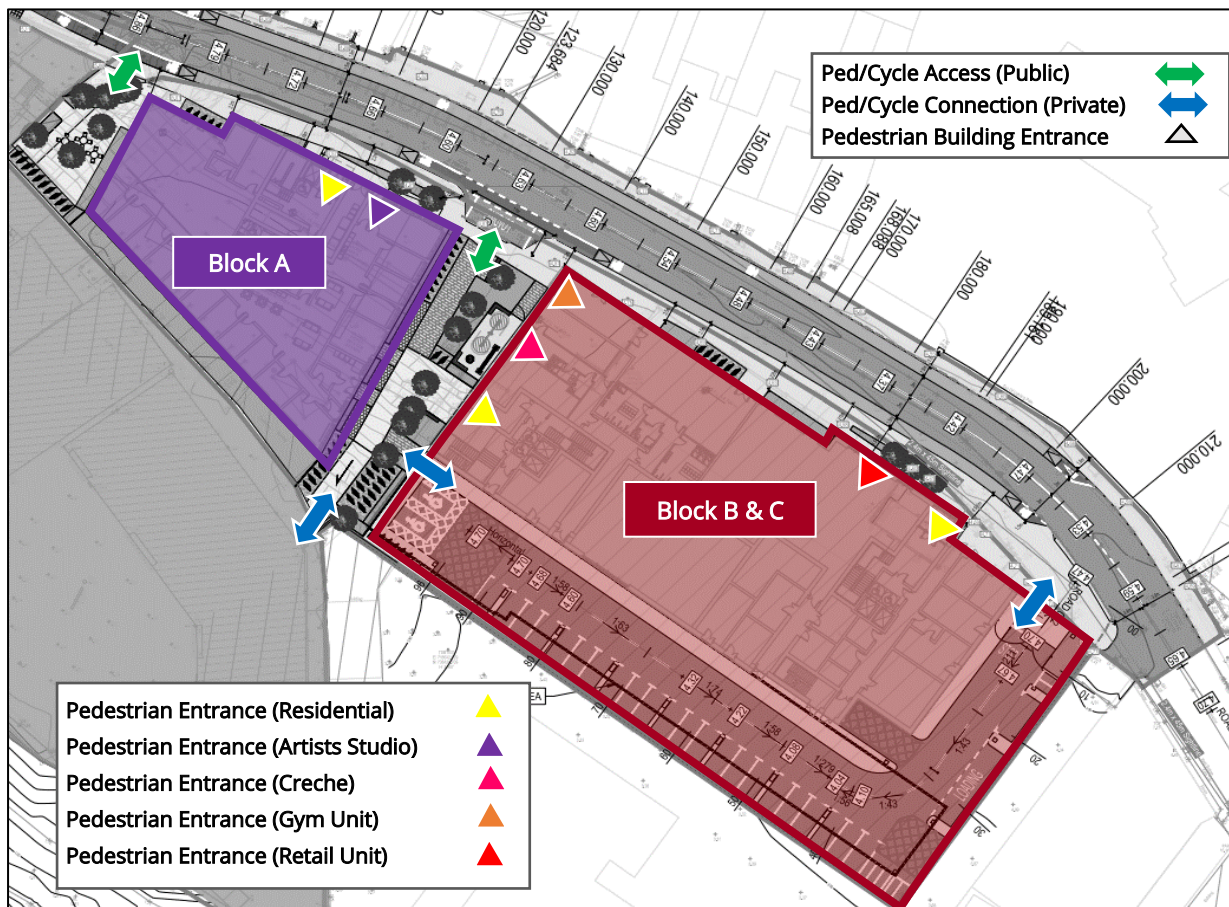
Proposed Pedestrian / Cycle Access and Connection Locations
